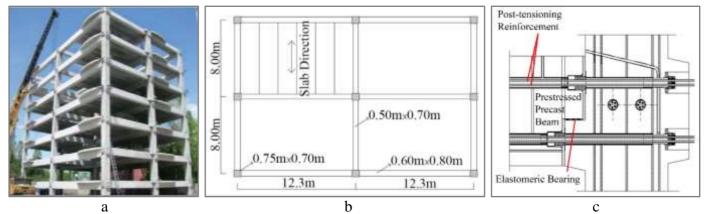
Aktek Palmiye residence (a), Plan (b) and Column-beam connection detail (c) (Özden et al., 2012) (Bayar, 2018)
